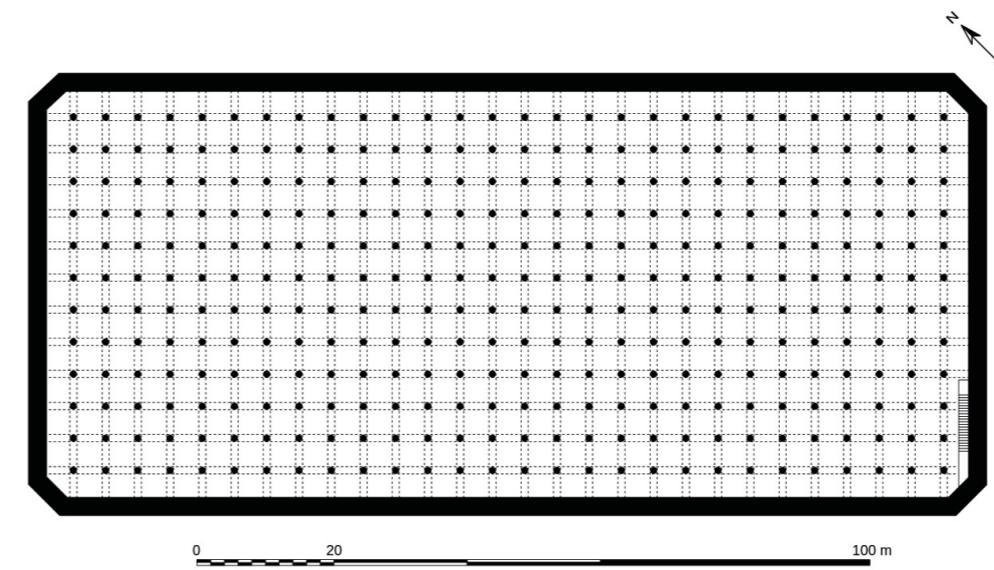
Floor plan of the Basilica Cistern (Zajaczkowski, 1608)
